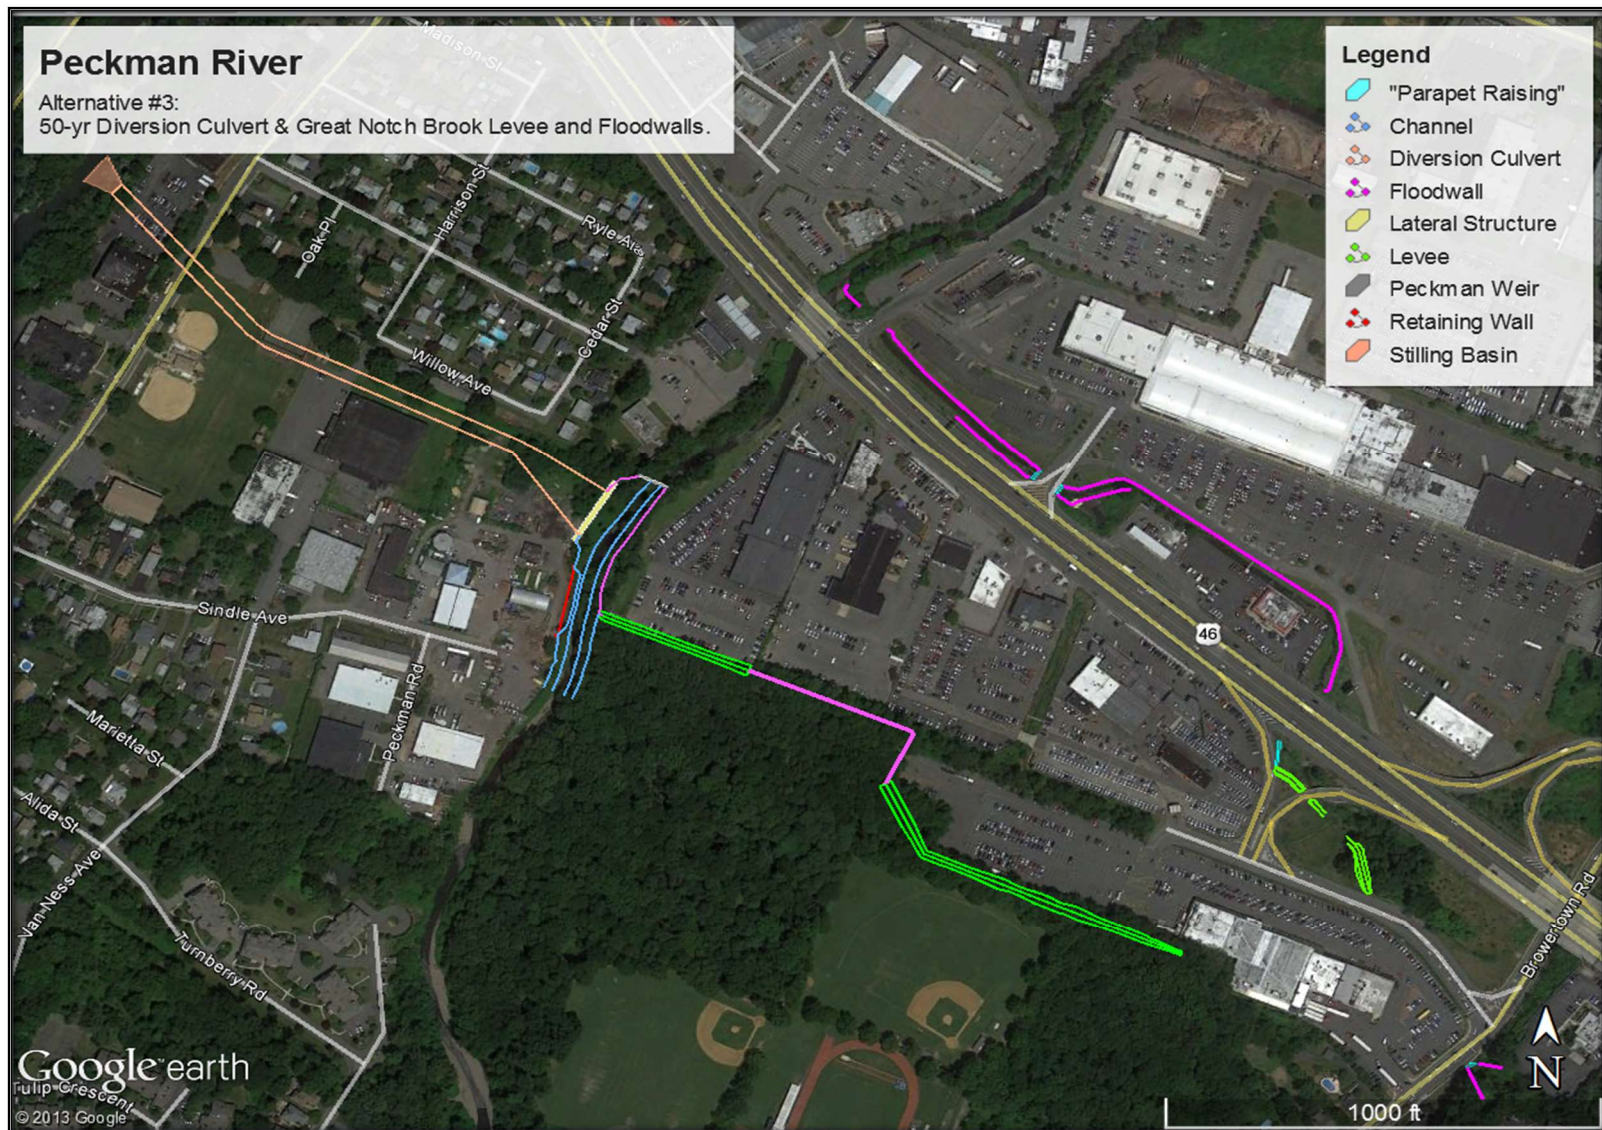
Alternative #3 – Diversion Culvert with Great Notch Brook Floodwalls.
